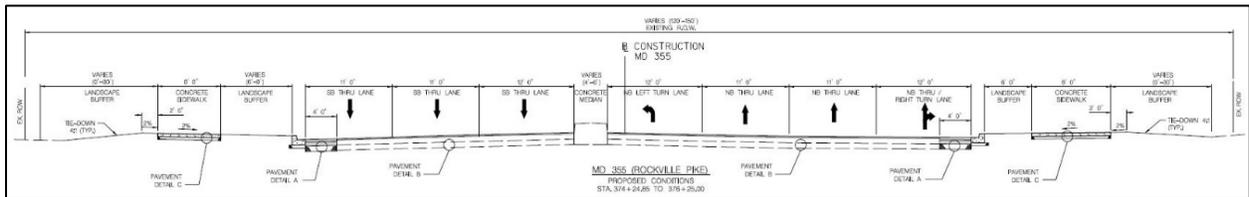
Proposed Phase 2 Typical Cross Section – Rockville Pike at Old Georgetown Road Approach
